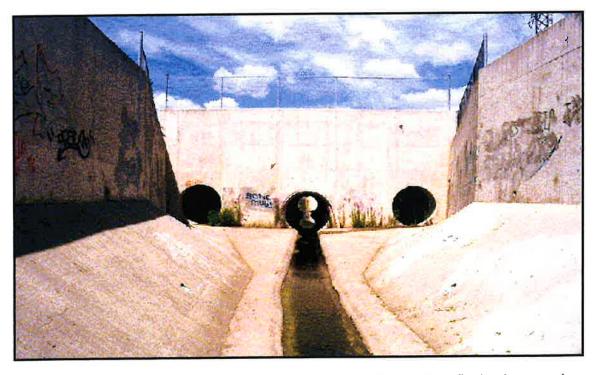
Looking upstream towards the CNR crossing with low flow levels confined to the centre pipe.
